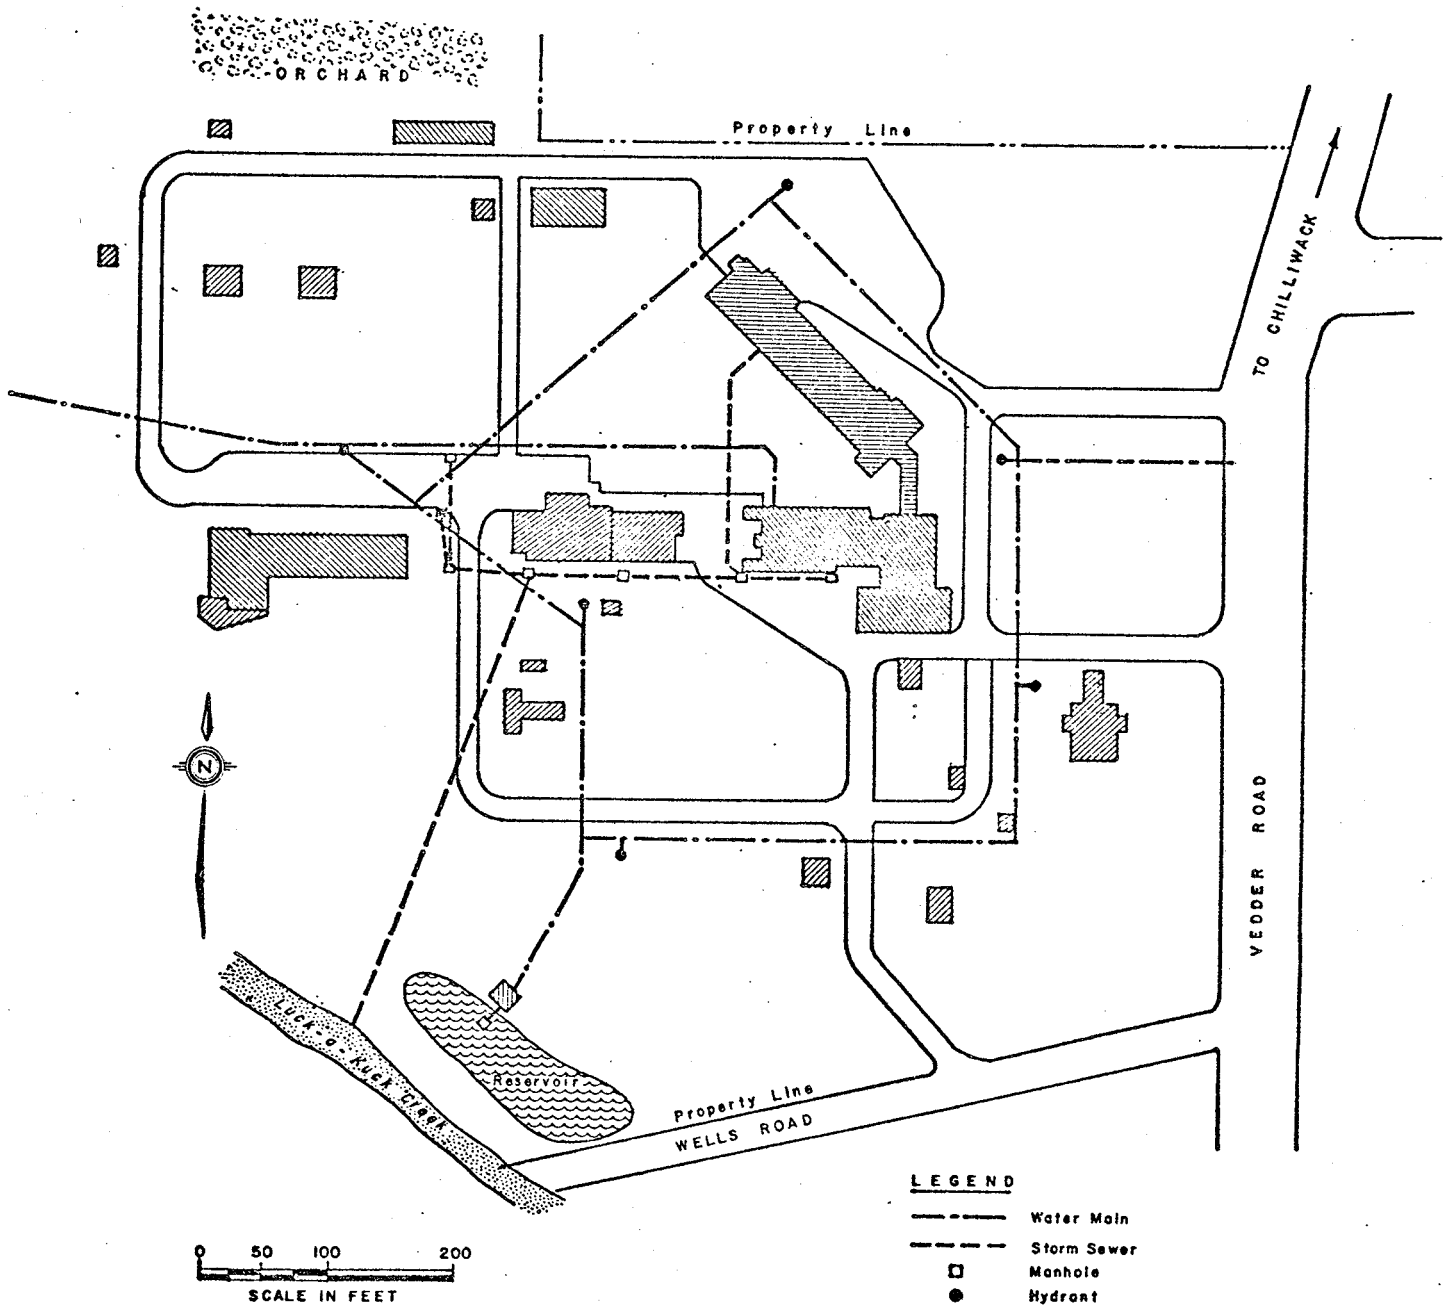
WATER SUPPLY AND STORM SEWER LAYOUT
